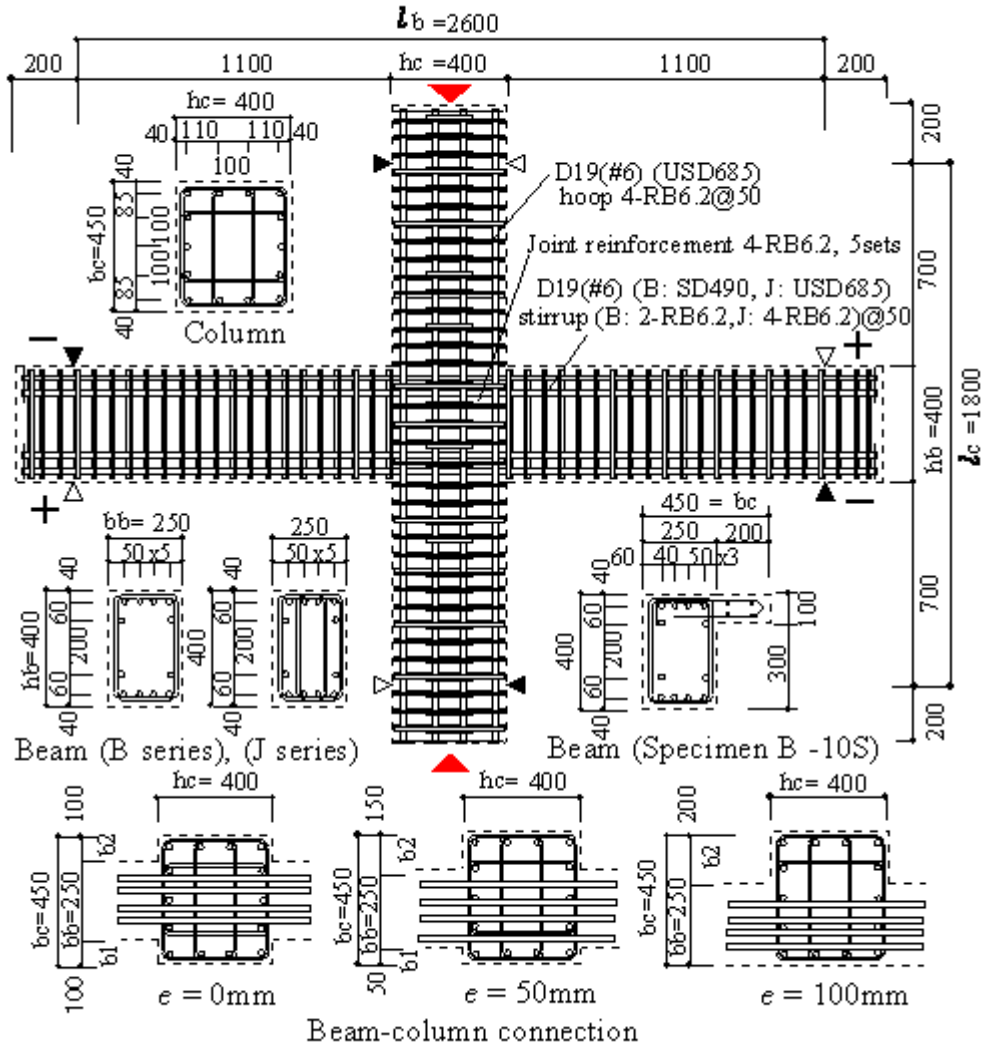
Dimensions and reinforcing details for specimens (All dimensions in mm).
